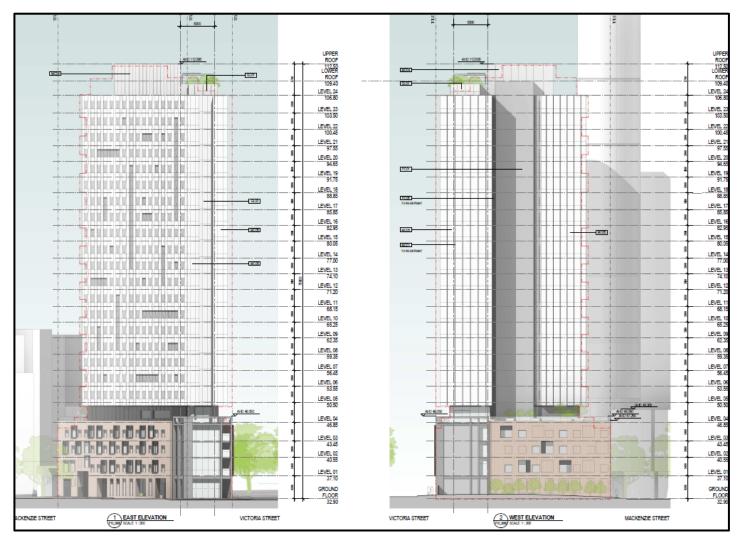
Excerpt from East (Victoria Street and MacKenzie Street intersection) and West (31-33 Victoria Street) Elevation (S.57A Amended Plans)
